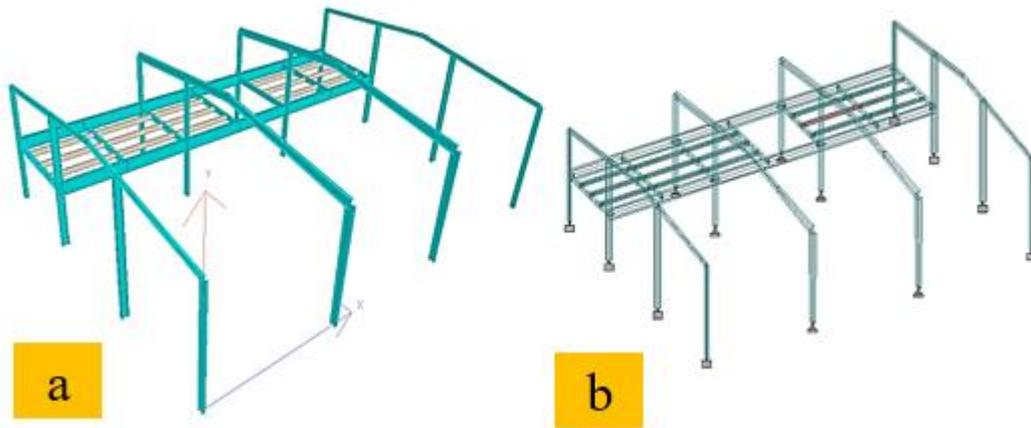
(a) Typical pre-engineered building system STAAD model; (b) dimensions & geometric properties of a hot rolled steel sections
